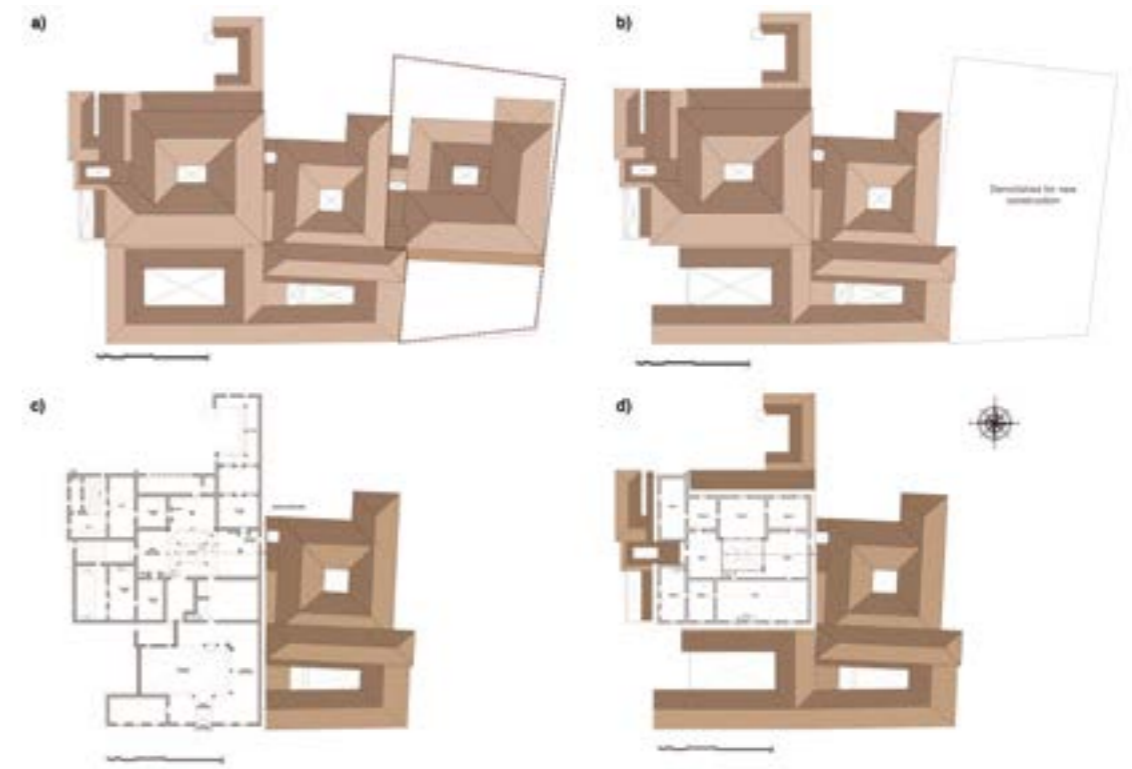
Transformation of a courtyard house a) Original footprint b) One side of the house is demolished c) There is an existing ground floor plan where one side of the house is owned by one family and the other by another d) First floor plan.
